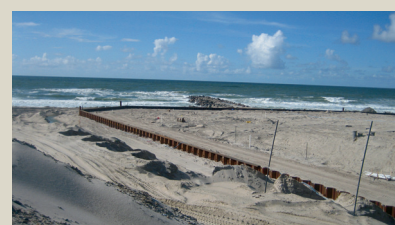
The contamination at "Groyne 42" is enclosed by a 14 m deep steel sheet piling
